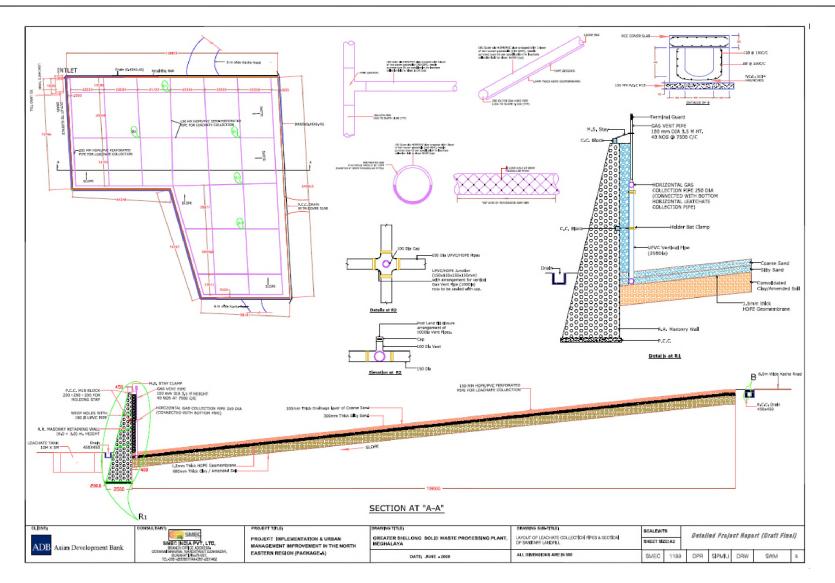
LAYOUT OF LEACHATE COLLECTION & SECTION OF SANITARY LANDFILL
